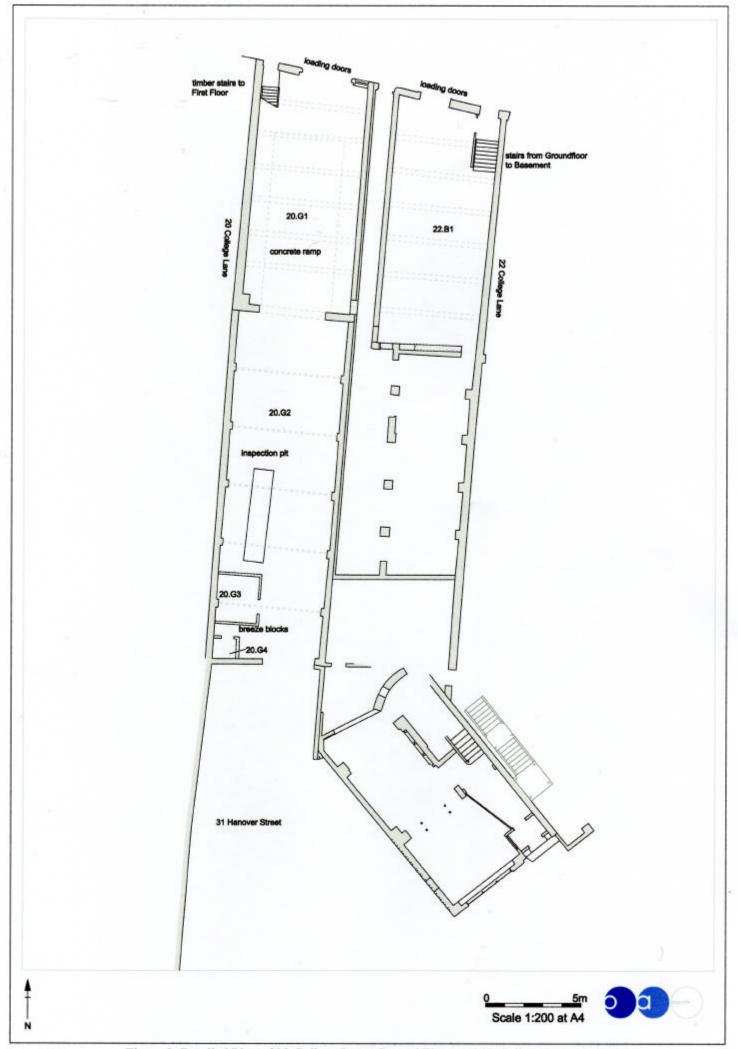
Detailed Plan of 20 College Lane, Ground Floor and 22 College Lane, Basement
